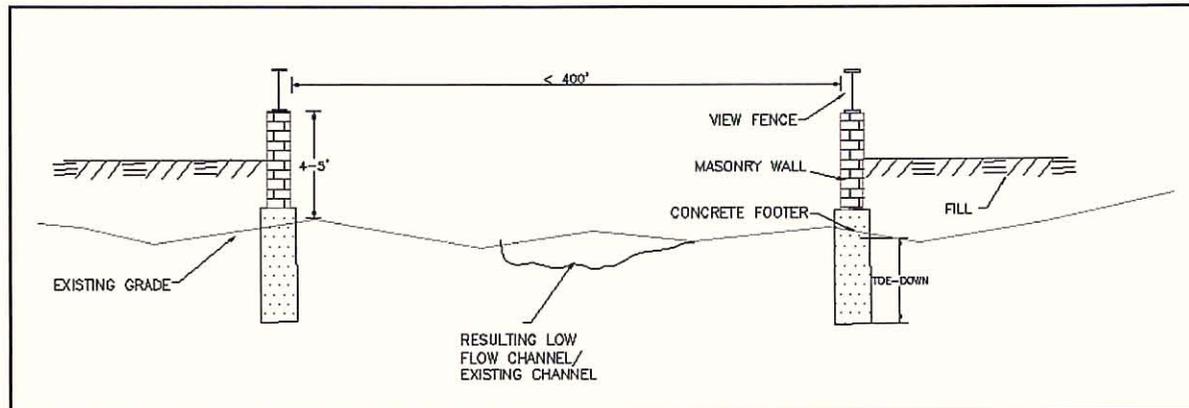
Concept Cross Section for Leveed Corridor with Walls (Alternatives A, B1, B2, B4, B5) (Not to scale)
